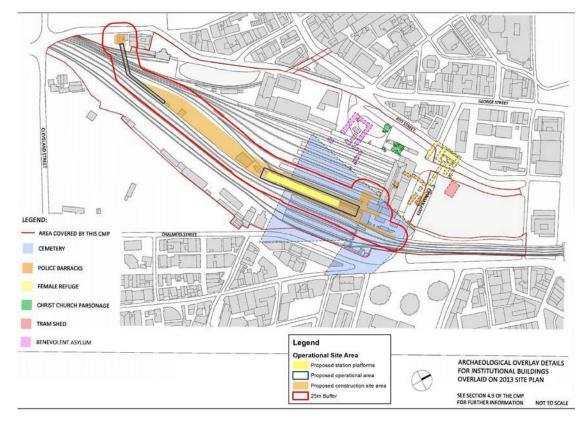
Overlay of early buildings on the current site plan. Source: 2013 CMP.
